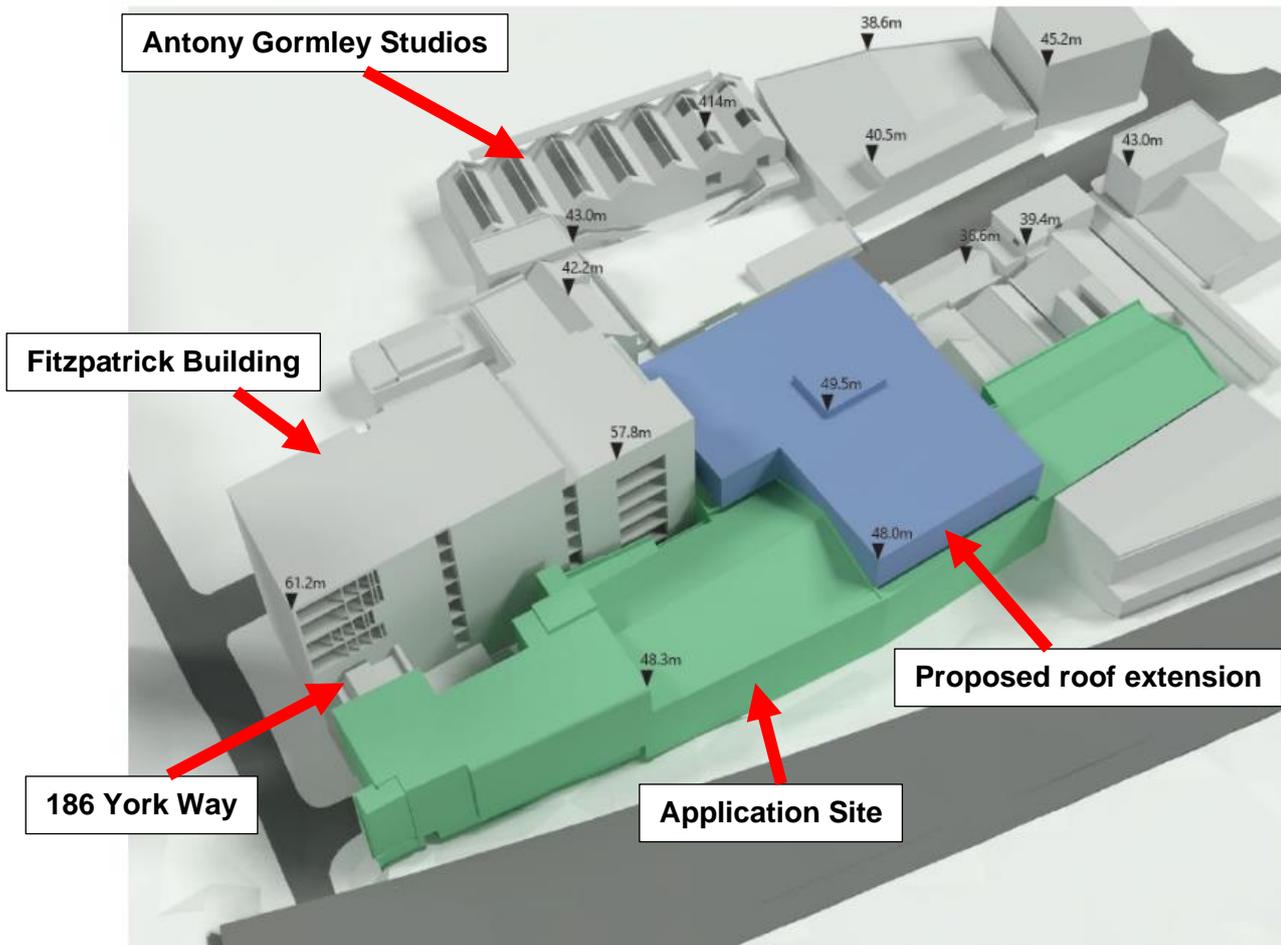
eb7 Daylight Report – 3D view of the proposed development and context (additional massing shown in blue, retained building shown in green)
